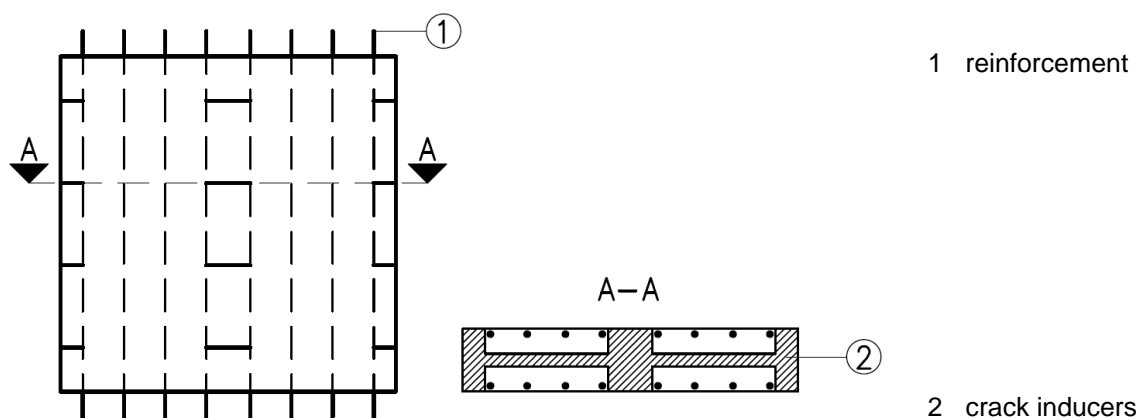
Example of a test member for connectors tested in cracked concrete
